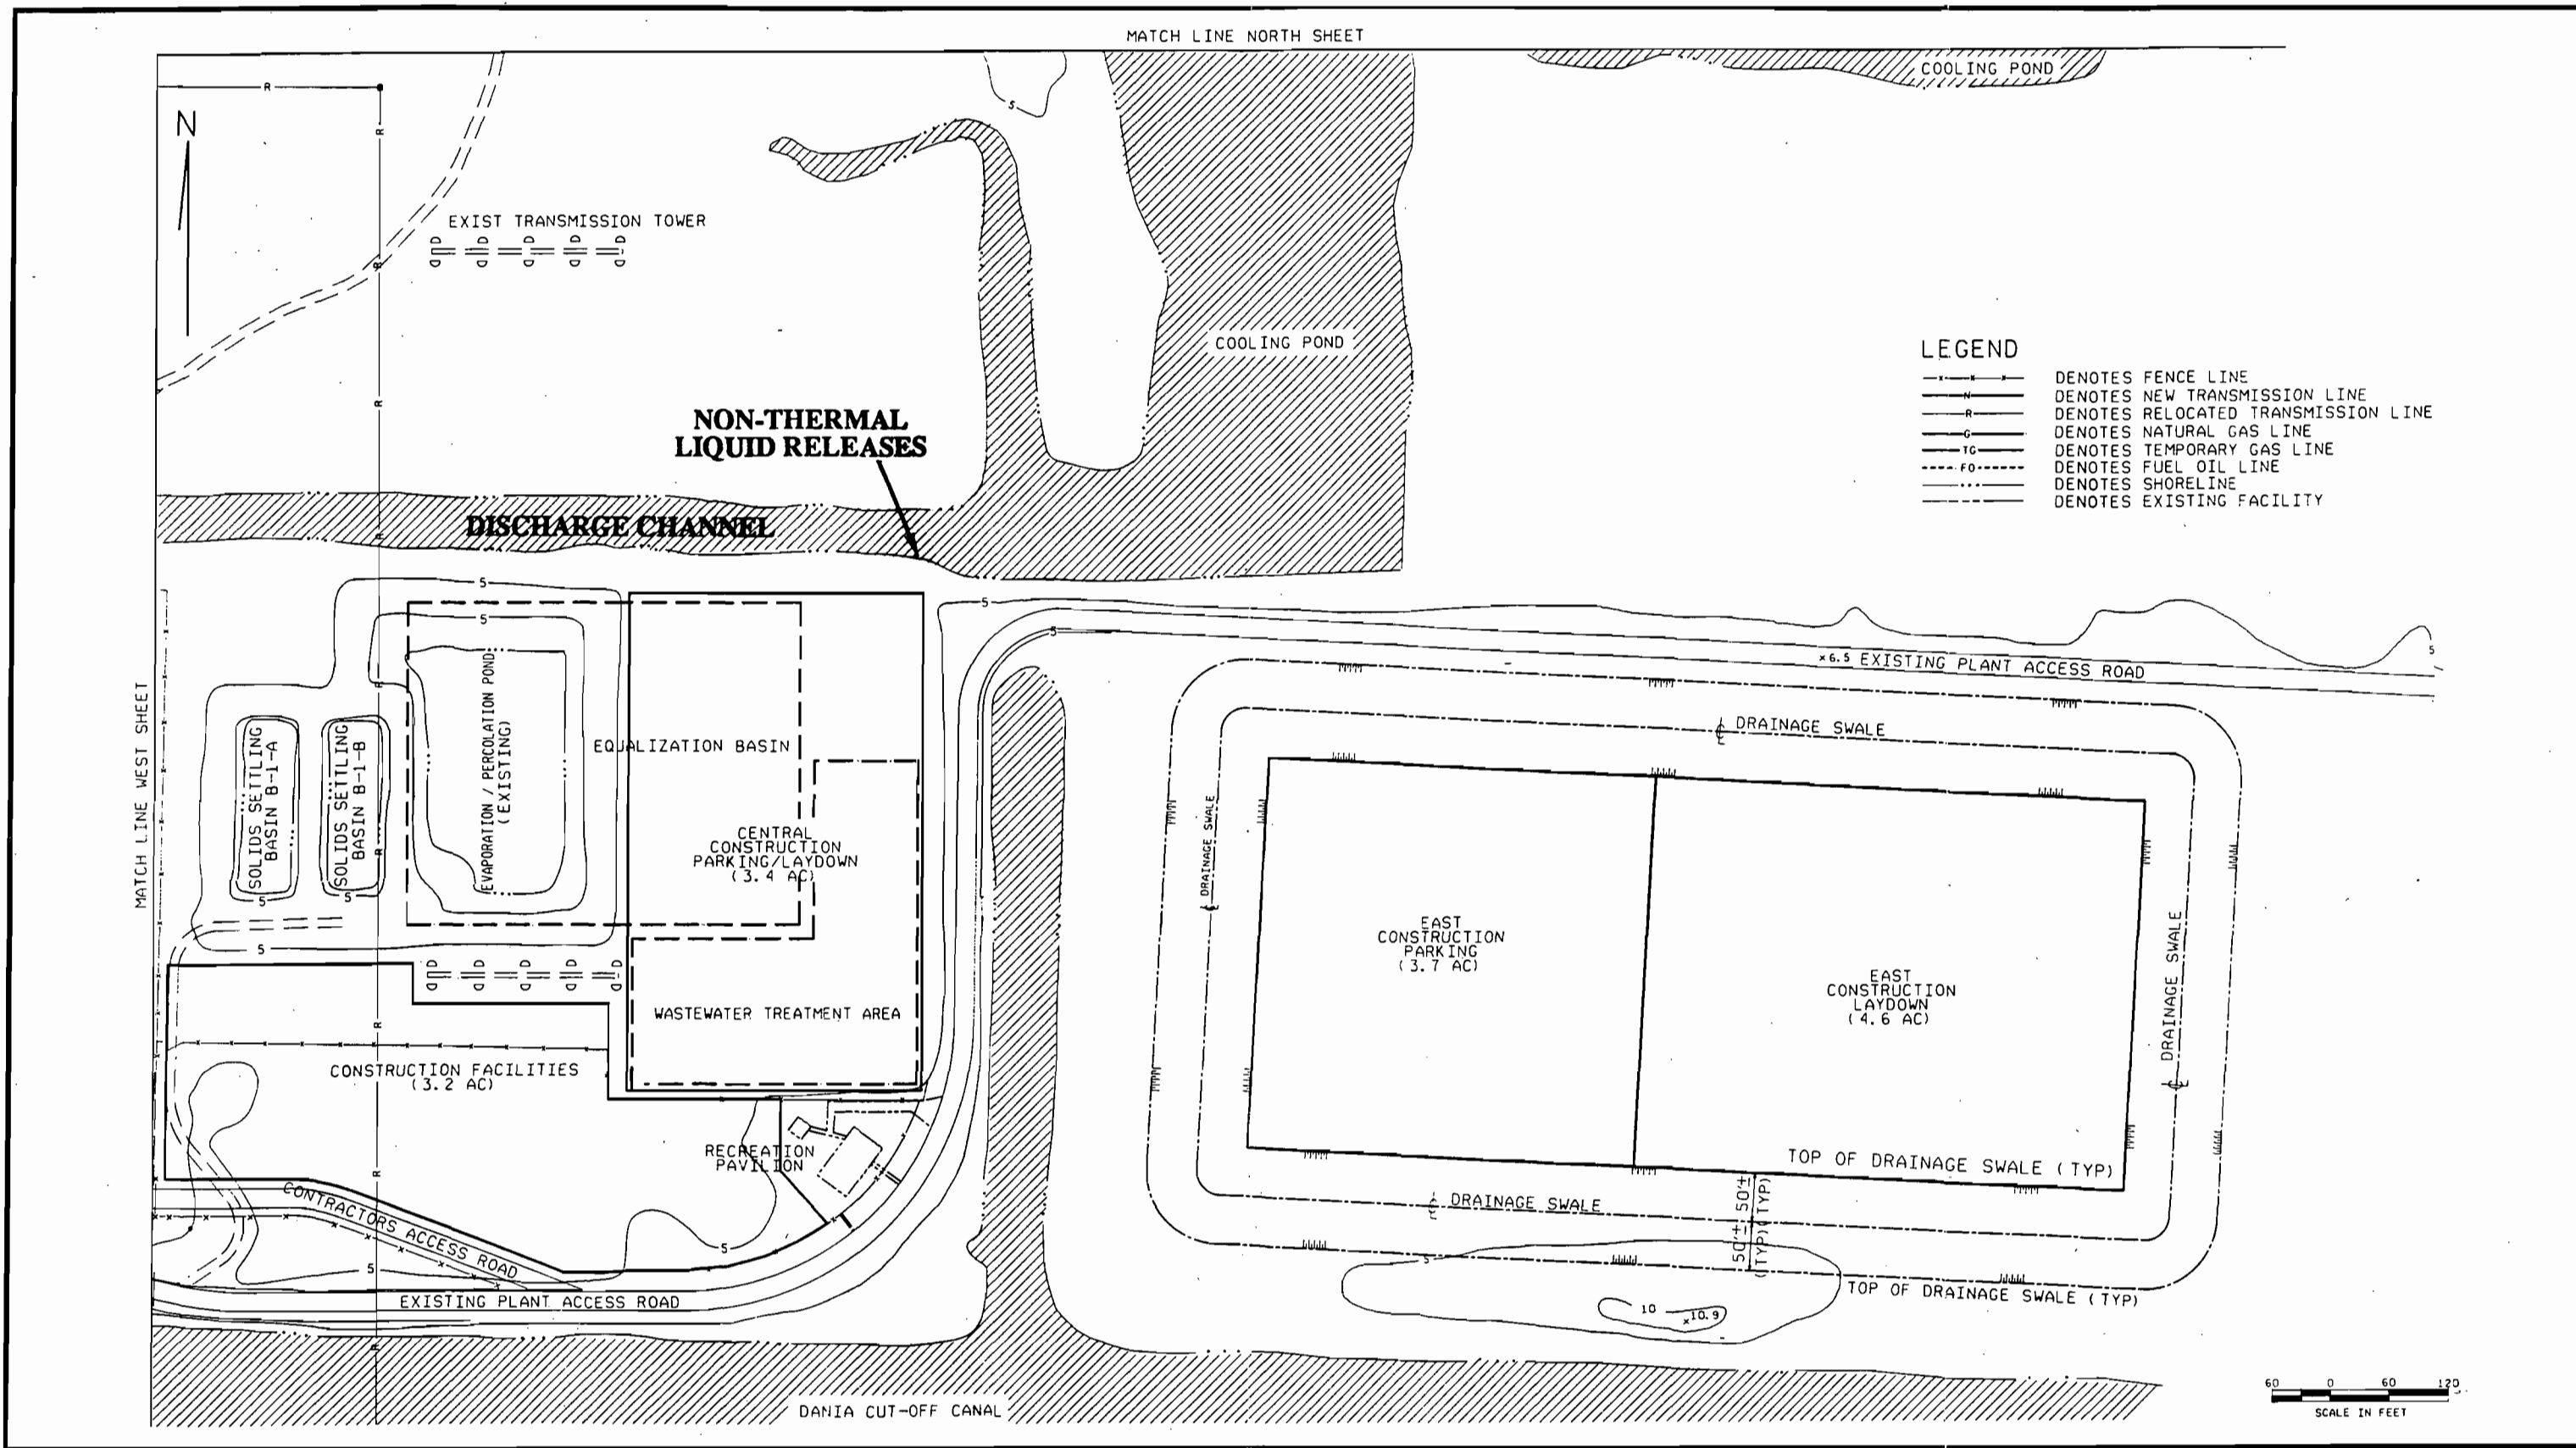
SITE LAYOUT EASTERN PORTION
